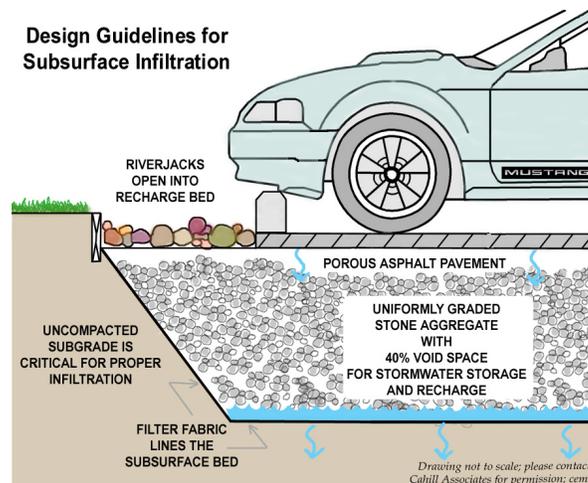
Design guidelines for porous pavement with subsurface infiltration
